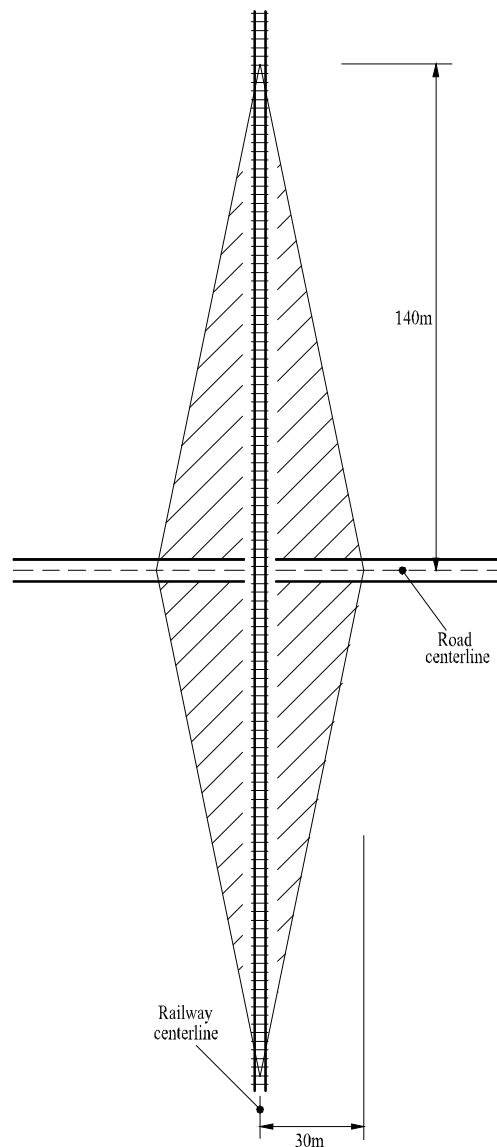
Railway Crossing and Traffic Sight Lines at Road/Rail Level Crossings (not to scale, dimensions are in metres)
